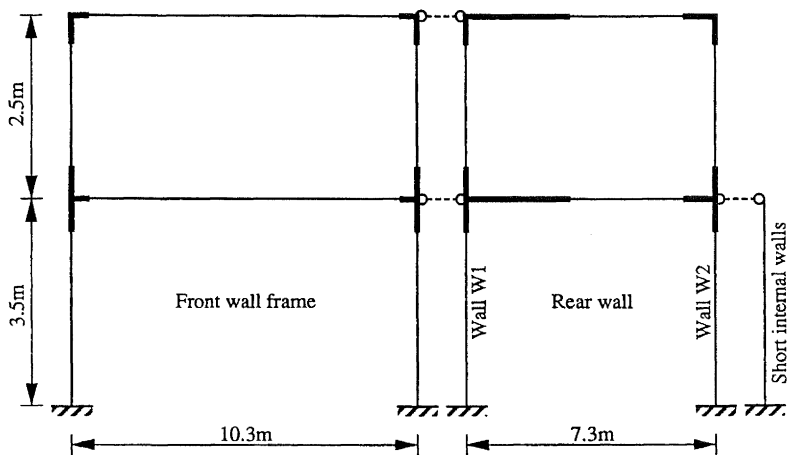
(b) Model of the two-storey reinforced concrete masonry (RM) Post Office building in Dannevirke (see also Figure 8(a)).
